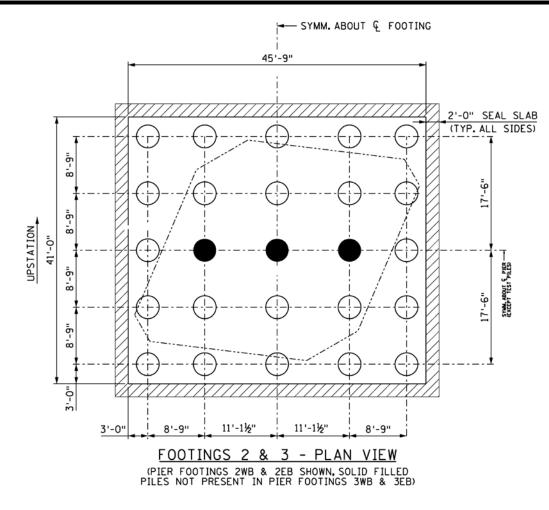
Piers 2 and 3 Foundation Plan View
